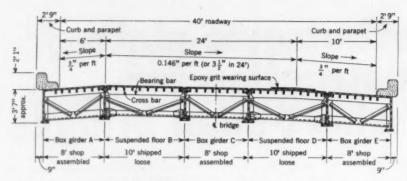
Cross section shows bridge of 80-ft span designed for orthotropic-plate design.
